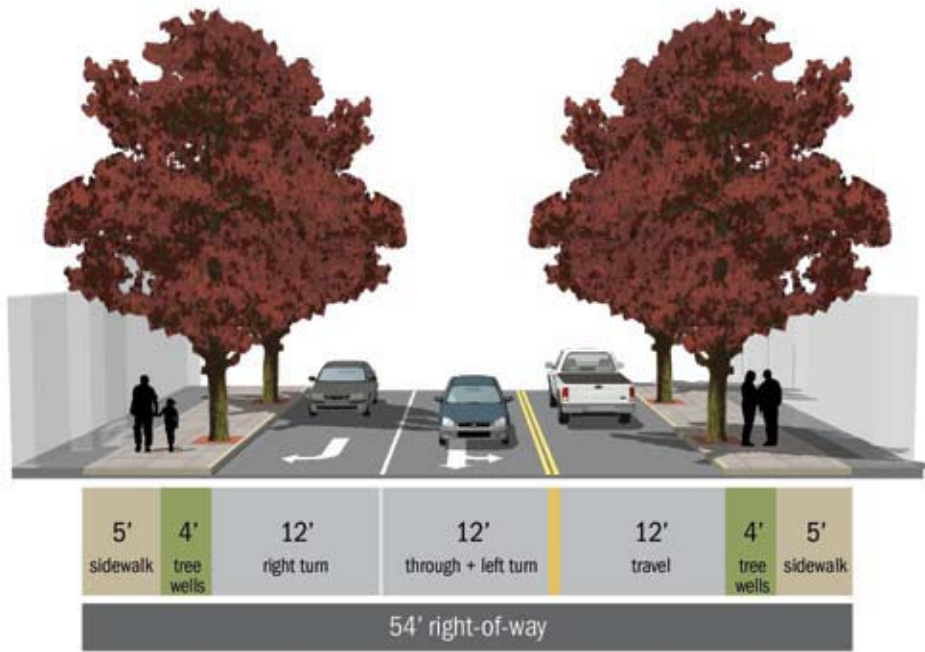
Conceptual Cross-Section for Ochoco Street – West of Main Street within existing right-of-way (looking east)
